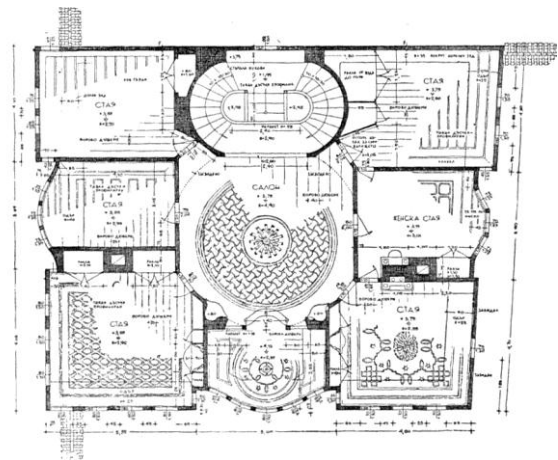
Kableschkov House in Koprivshhtiza, Upper Floor Plan.
